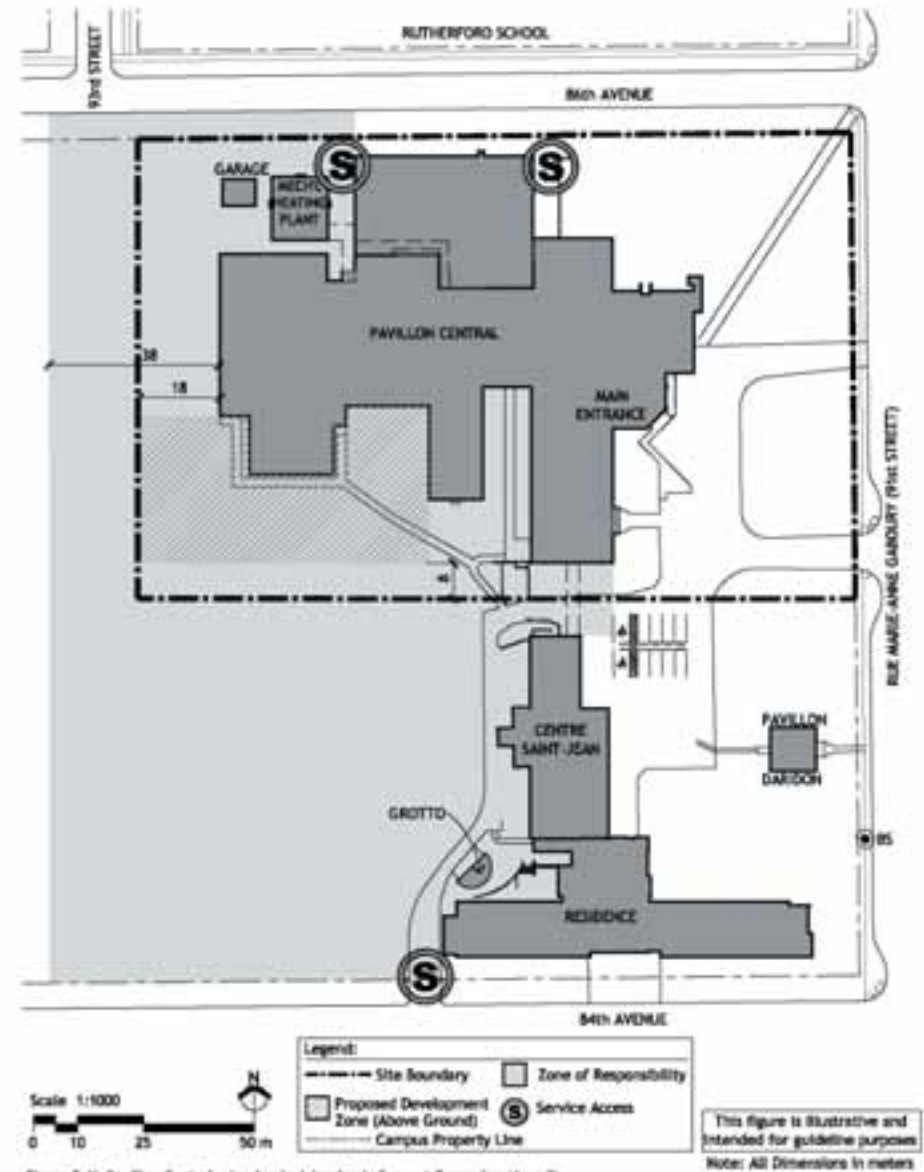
Pavillon Central - Academic / Academic Support Expansion (Area 2)
